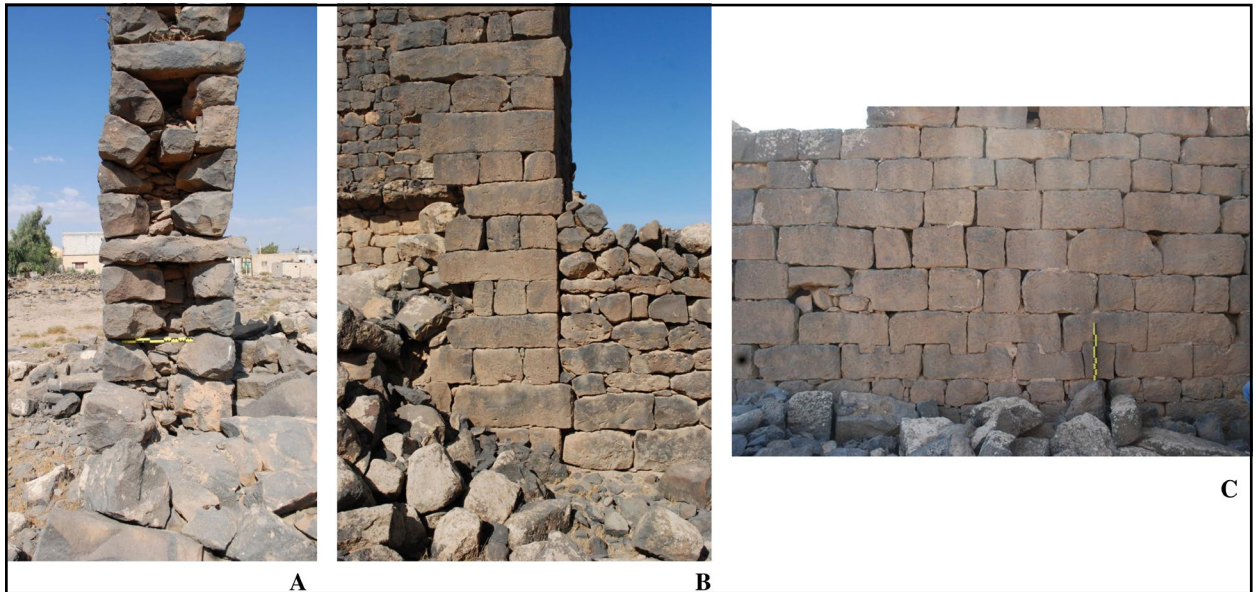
A: Section wall with headers, Umm as-Surab; B: Still-standing corner, Umm al-Jimāl; C: Lower part of the tower of house XVII at Umm al-Jimāl: mortise and tenon technique (photos by Piero Gilento).
